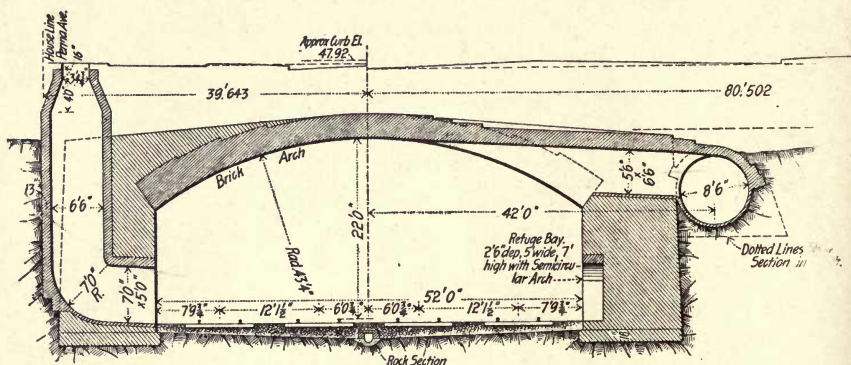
Ventilation of the Pennsylvania Avenue Subway.
